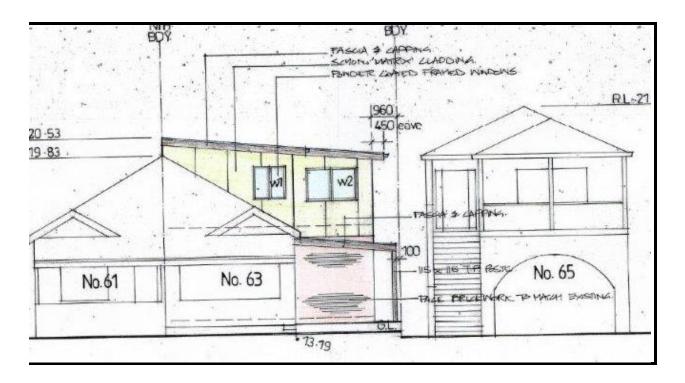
Proposed Streetscape Elevation (Source: Peter Banfield, 3 July 2017)
